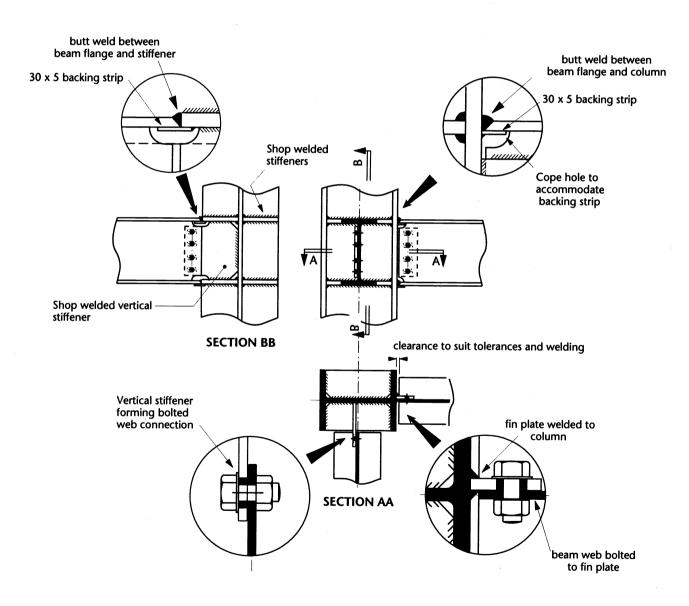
Site connection - flanges welded, web bolted
